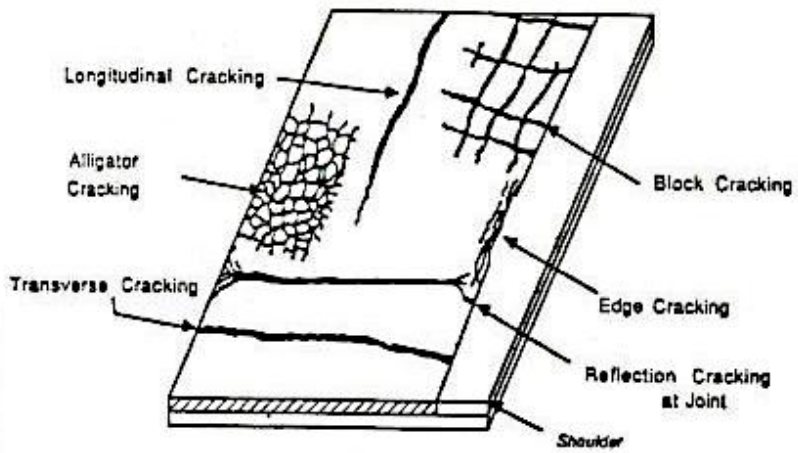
Sketches of Typical Distresses on Flexible Pavements.
